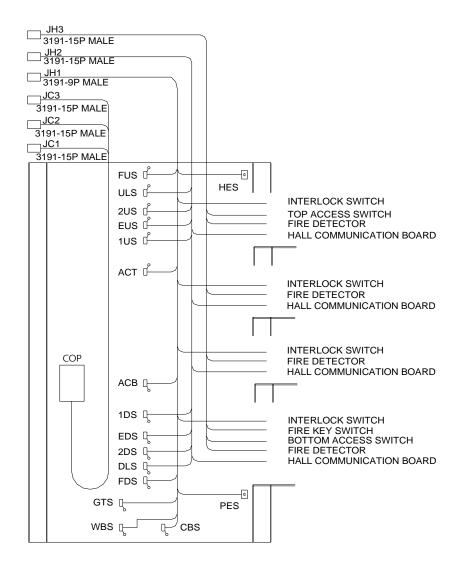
TRAVELING CABLE AND HOISTWAY WIRING
